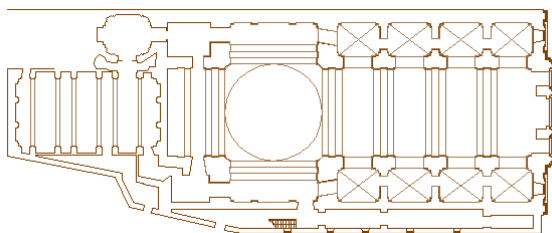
Floor plan of San Ildefonso's Church in Toledo
